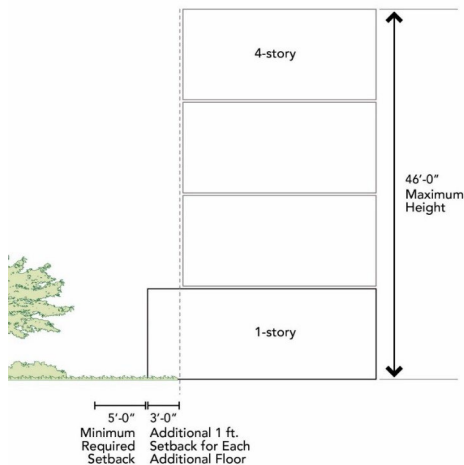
R-1 Corner Lot Side Setbacks
